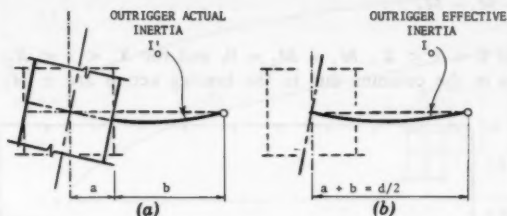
(a) Wide-column Action of Wall and Outrigger; (b) Action of Equivalent Full-Span Outrigger
